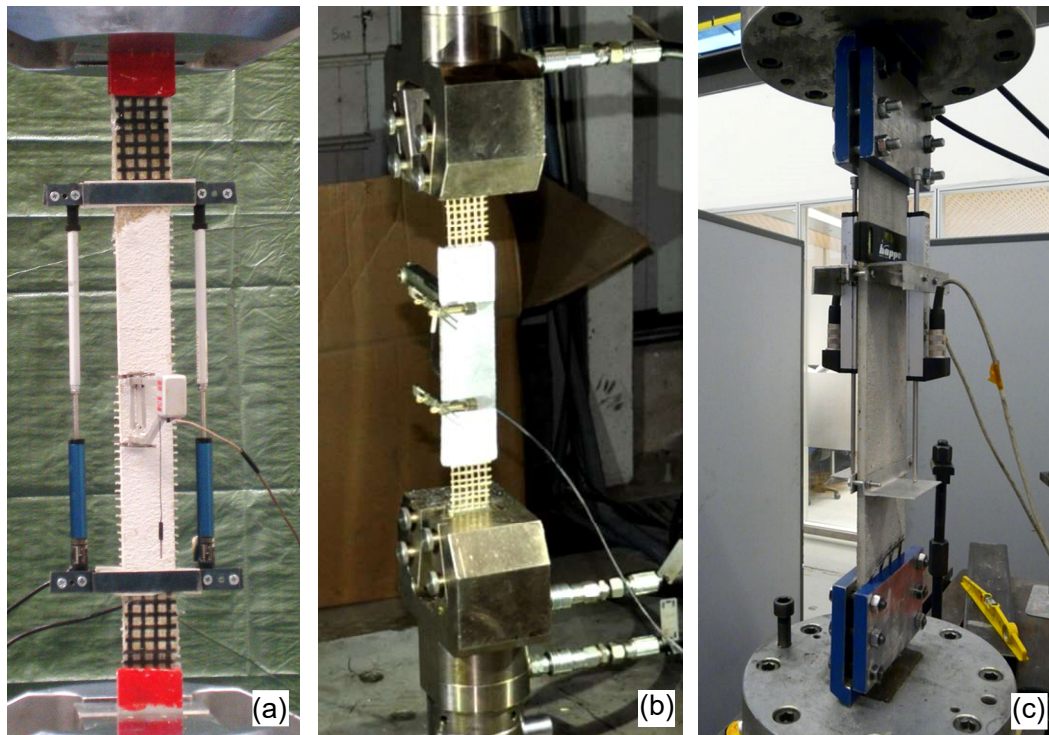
Setup used for tensile tests by UNIRM3 (a), UMINHO (b) and TECNALIA (c)
